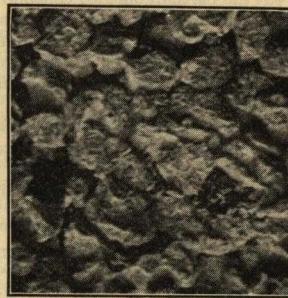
Machine-made concrete block with coarse limestone—no facing mixture and very little sand and cement.
